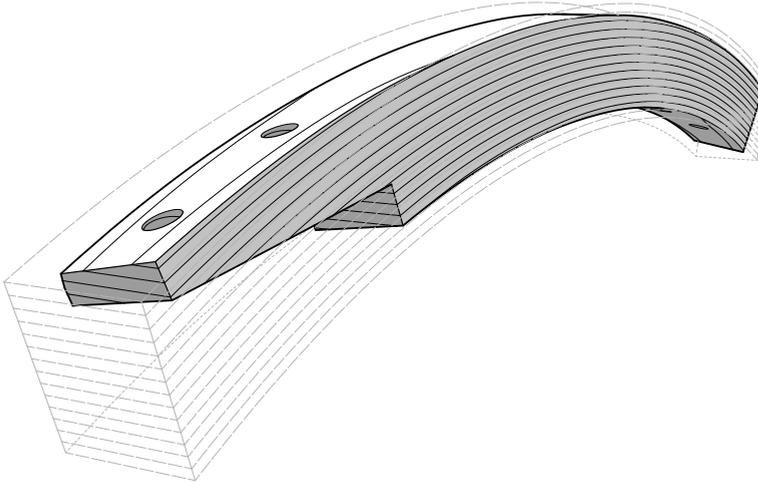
A free-form element cut out of a single-curved glulam blank. The glulam blank (dashed outline) envelopes component RB_4_0 from Demonstrator: MBridge. Traces of each lamella leave their imprint on the final design geometry.
